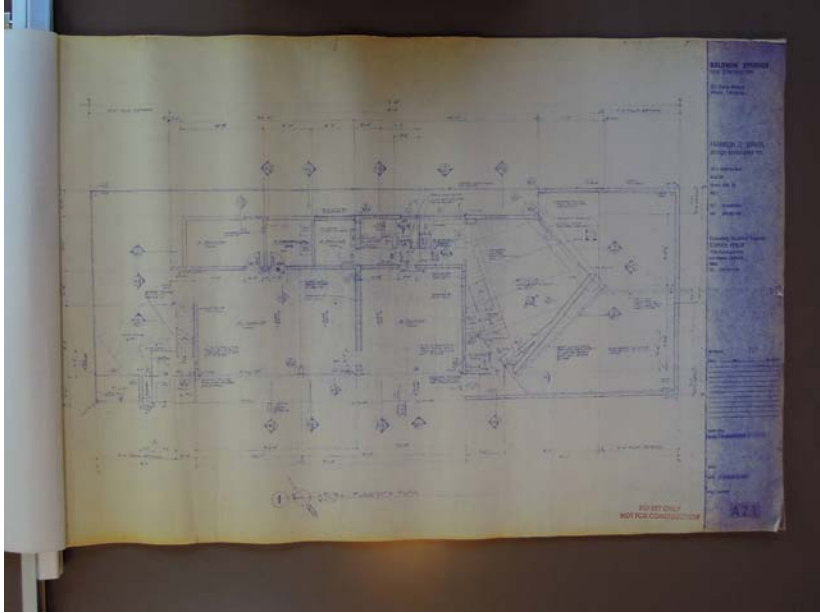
Baldwin Residence. Plan, first floor, blueprint.
